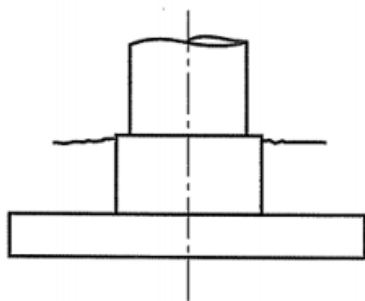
Patrick and Henderson foundation (Tensionless Pier Wind Turbine Foundation)
